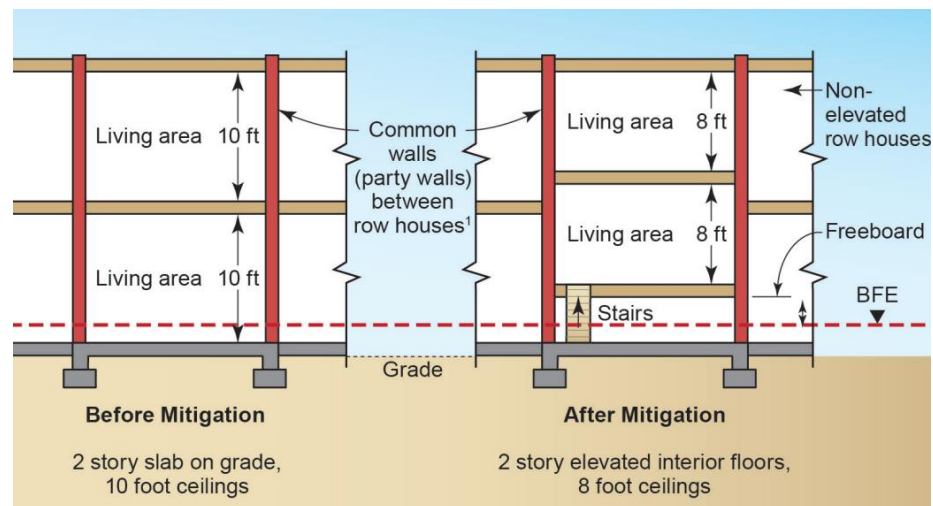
Example of elevating the lowest interior floor before and after flood mitigation (FEMA, 2015).
